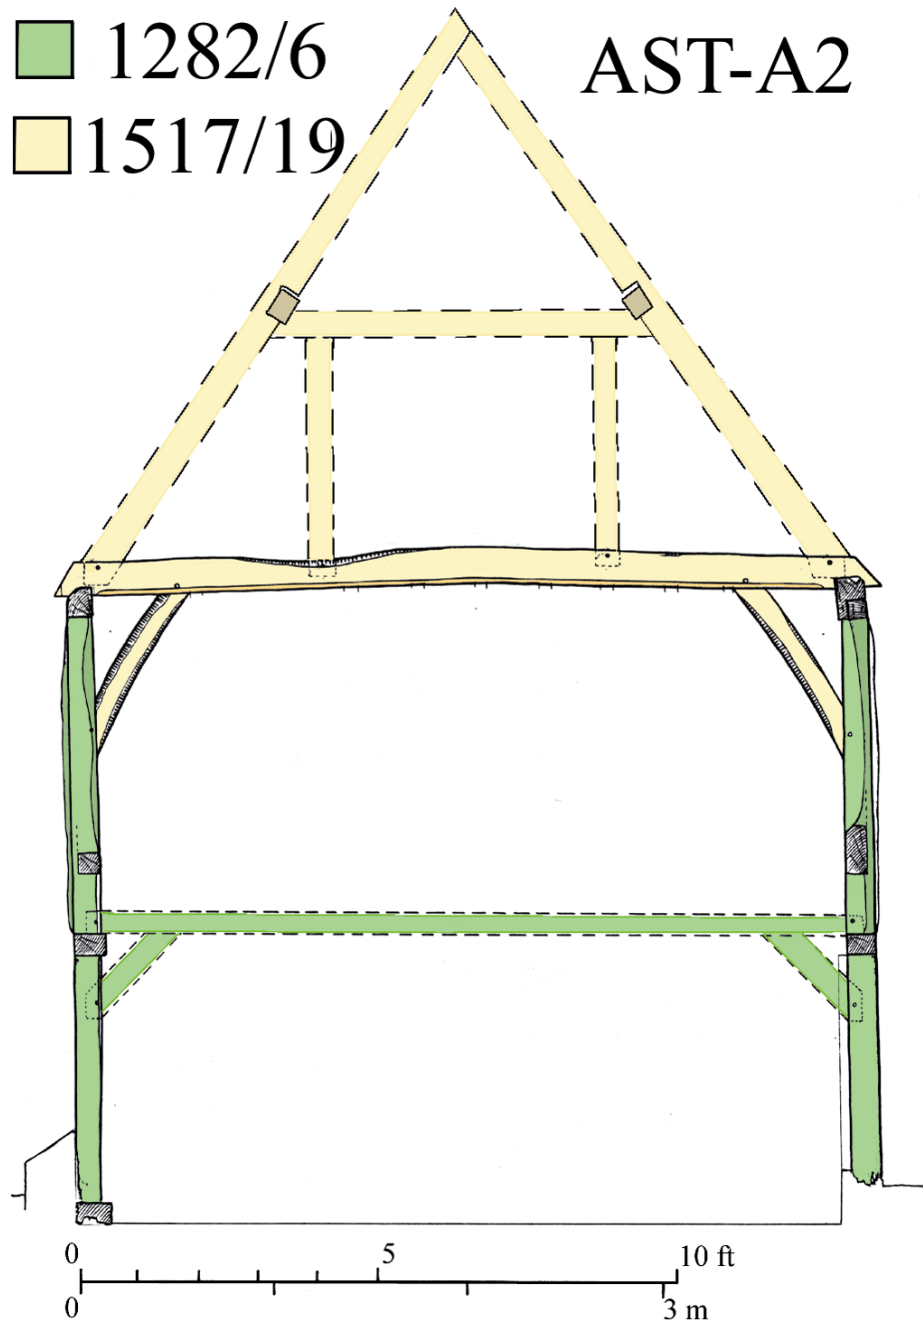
Section of truss T2. The approximate profile of the destroyed later roof timbers is dashed.
